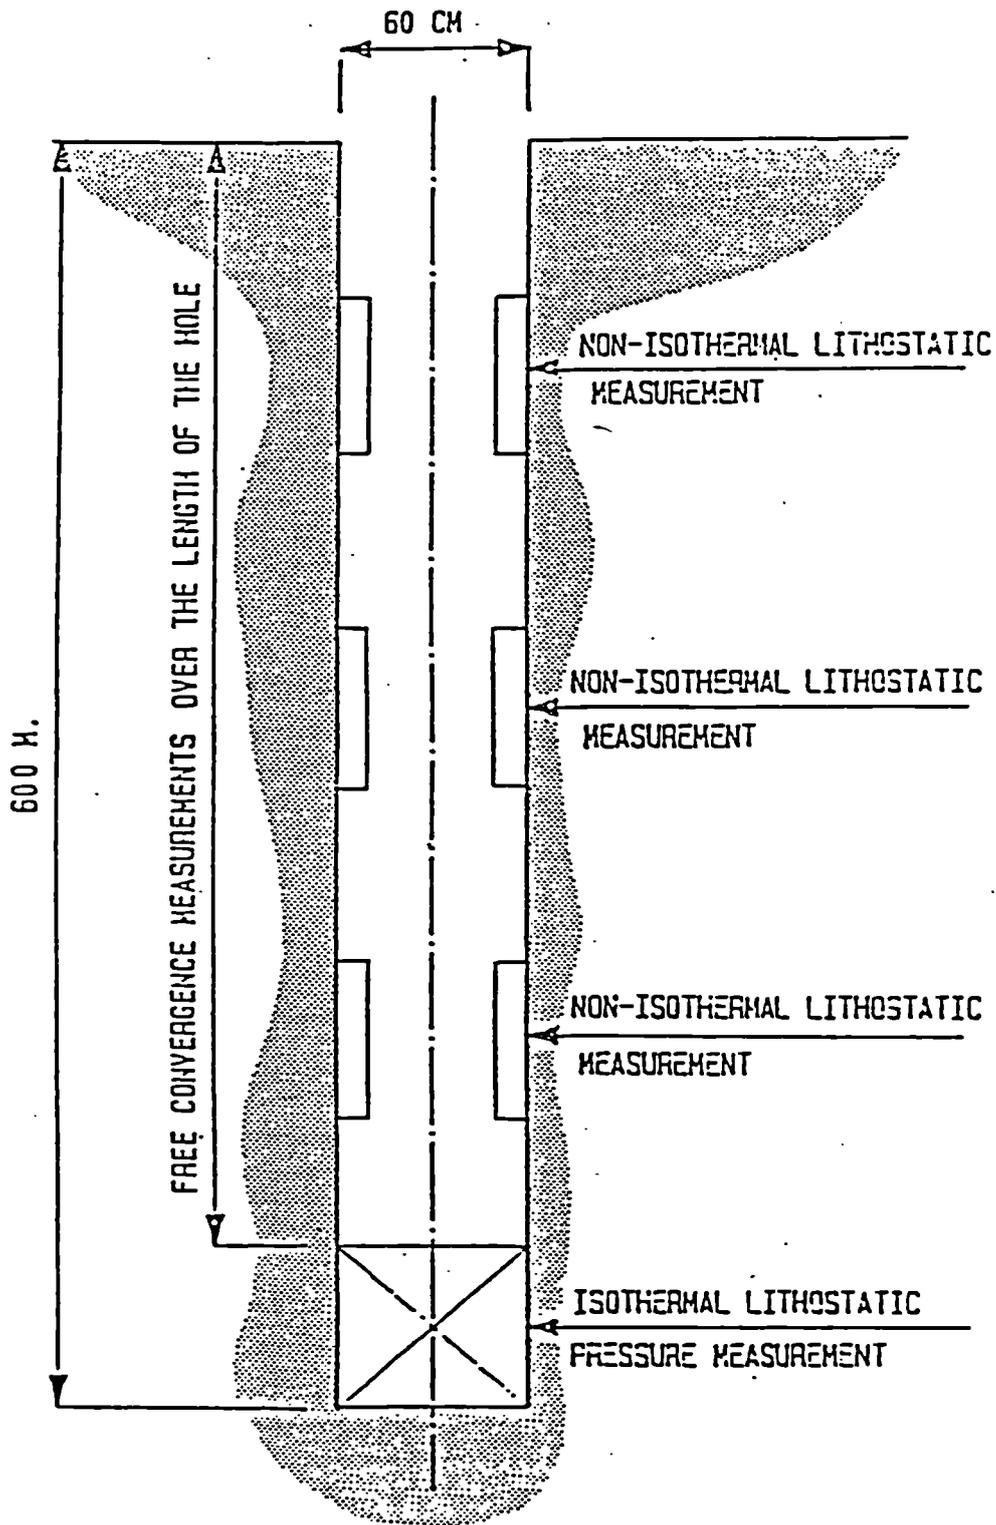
Sketch of the 600 m bore hole measurement set up.
